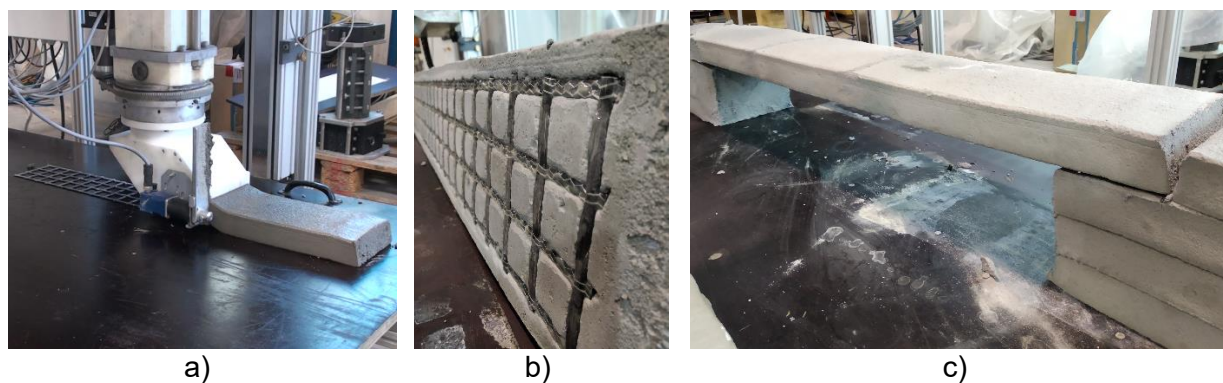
a) Production of a textile reinforced beam using 3D concrete printing, b) bottom side of the beam, c) demonstration of the use of the beam: lintel with 800 mm span.
